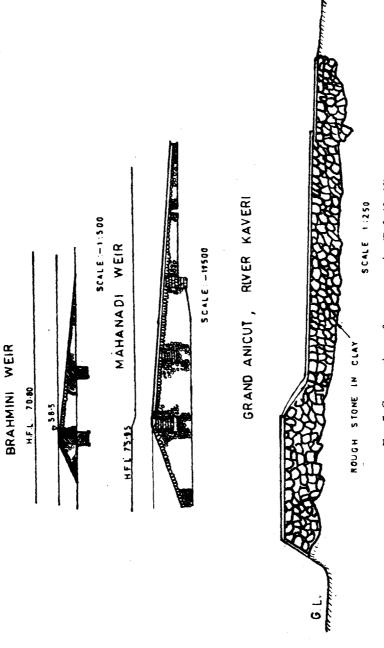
Cross-sections of masonry weirs (Ref. 12, 13).
